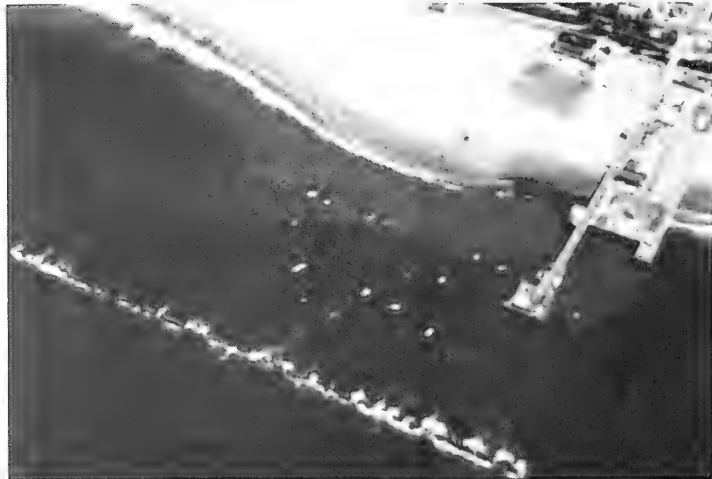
Shoreline response to initial construction of Santa Barbara breakwater
